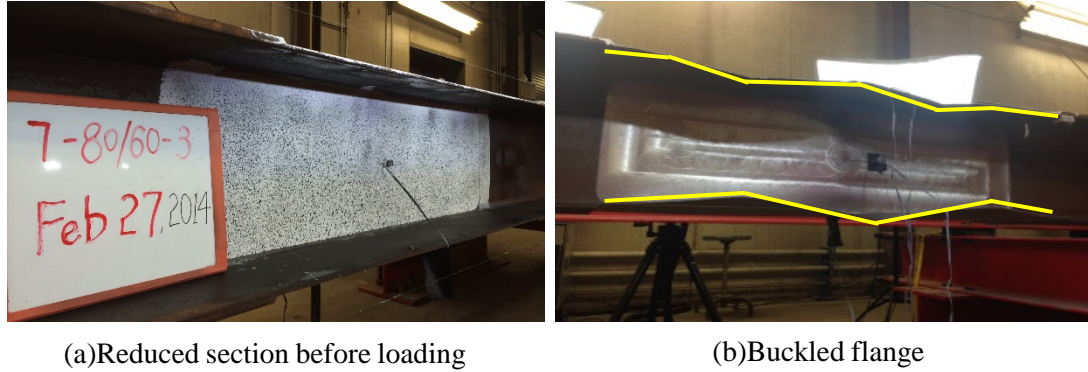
Flange local buckling and one-way bending of Pile 80/60/V
